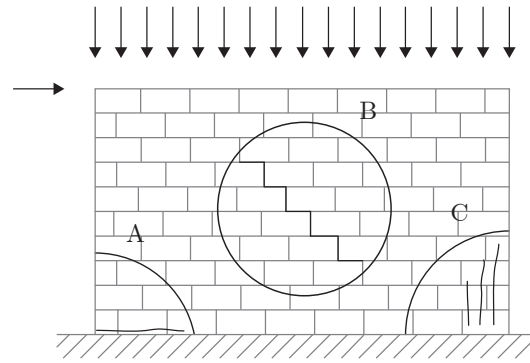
Different types of in-plane failure suitable to occur in masonry bearing walls. Adapted from [Lang 2002].
